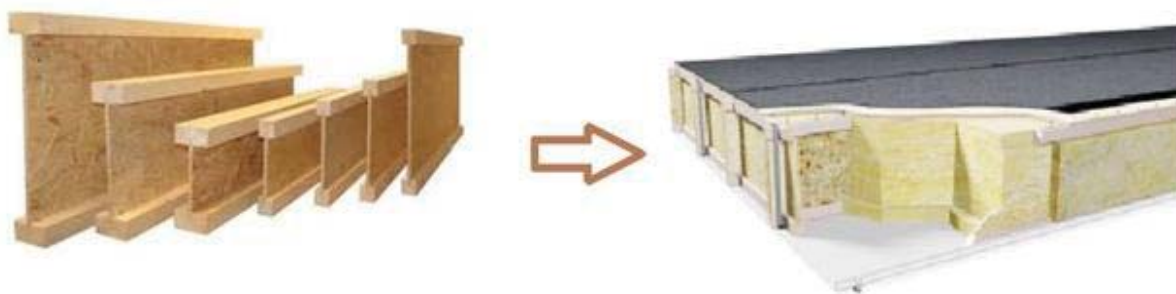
I-joists manufactured by the first company and roof elements manufactured by the second company
